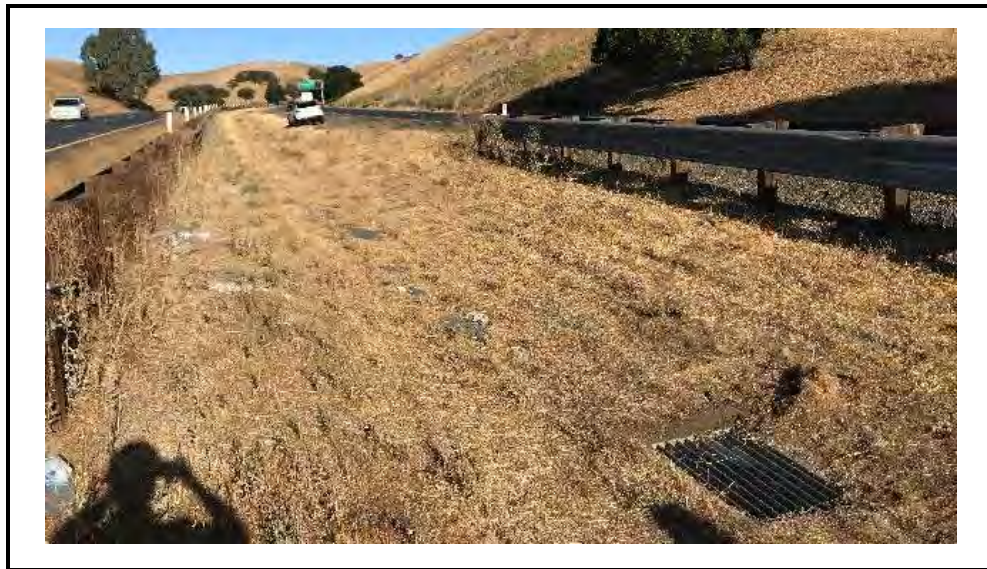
PHOTO B: VEGATED STRIP AND SWALE – DOWNSTREAM (NORTHWEST)
